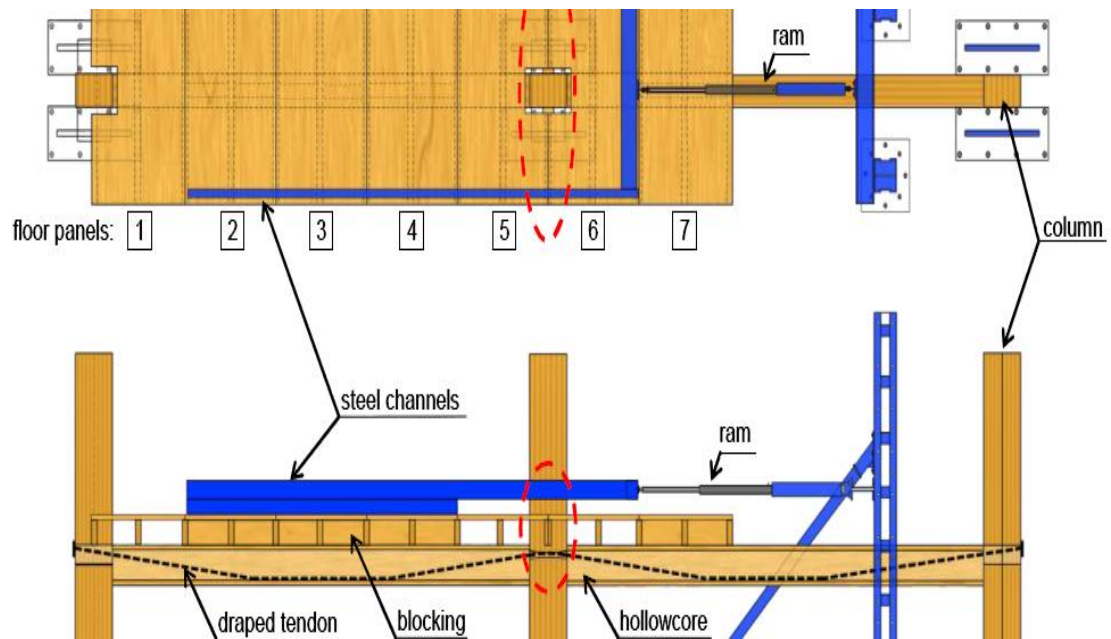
Test setup of a 2 bay frame with floor panels (Moroder et al. 2013)
